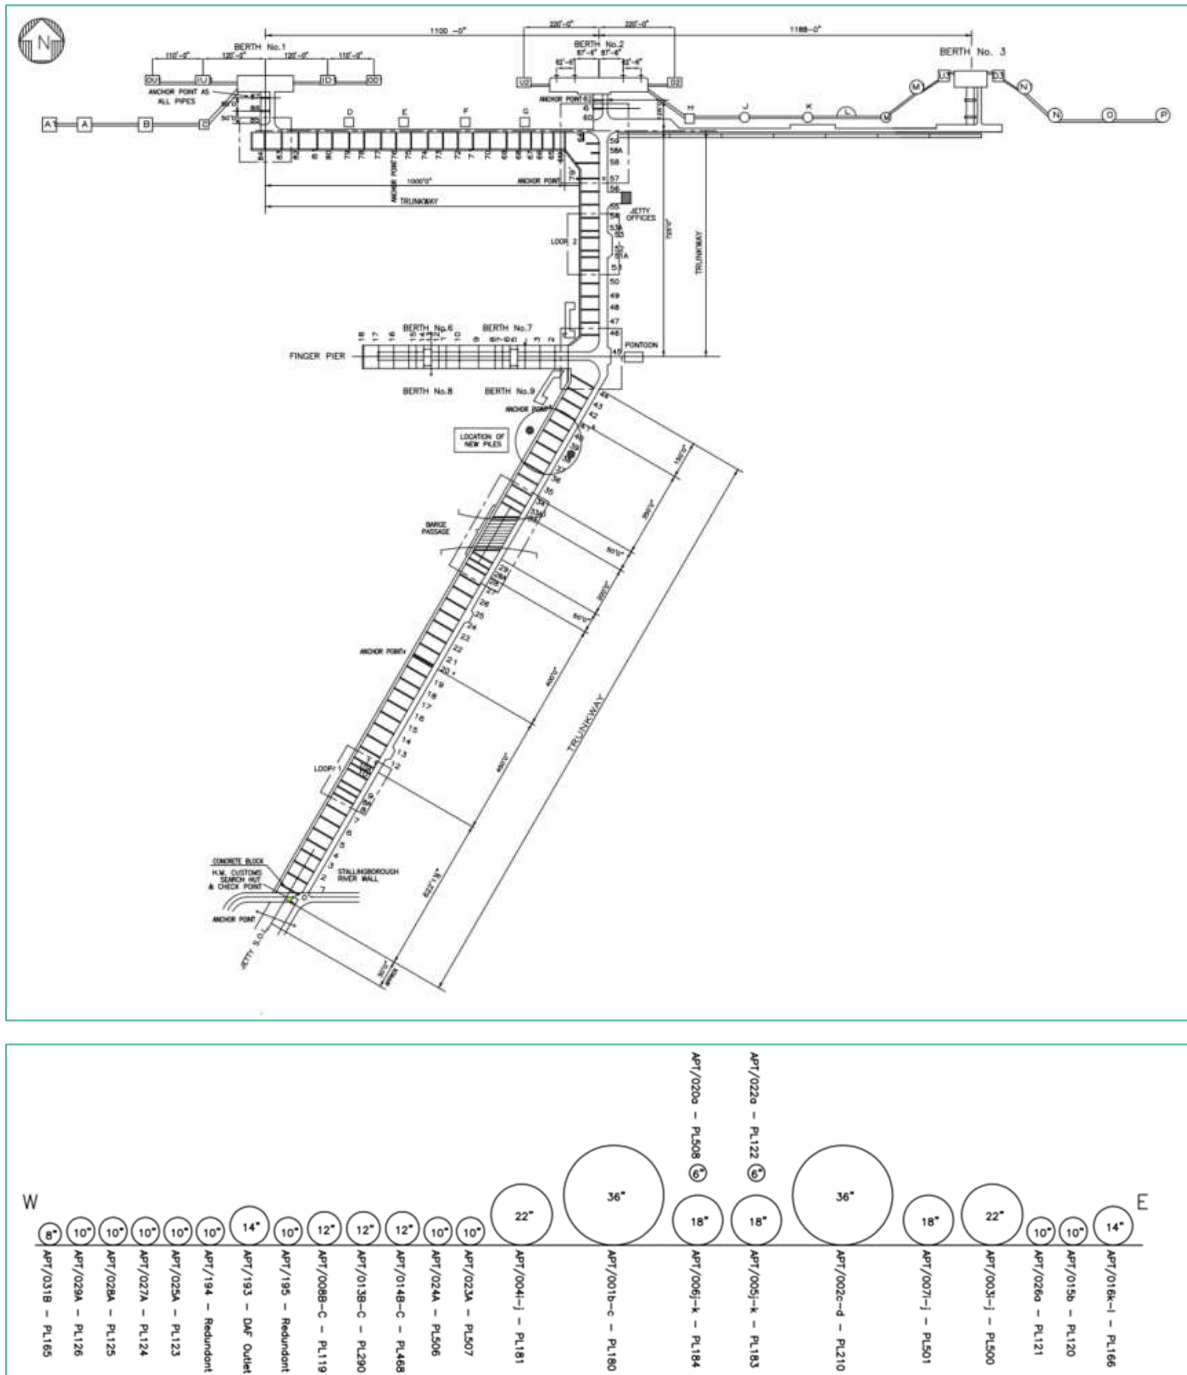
IOT layout (top, layout and bottom, pipe track on Trunkway).
